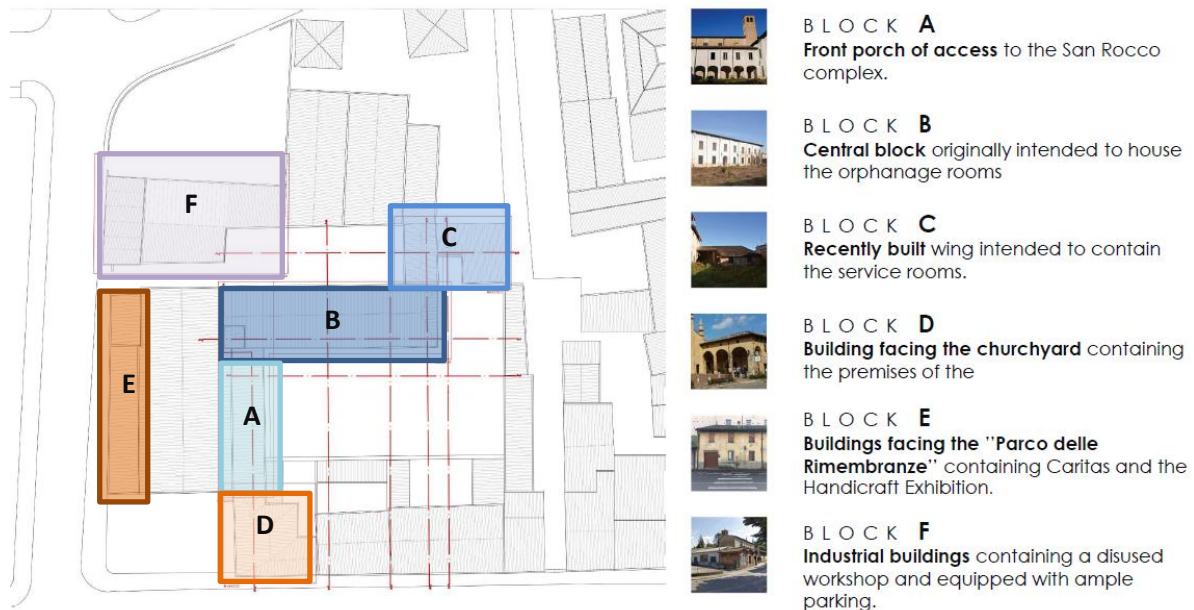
On the left the roof floor plan of the complex, where the portions of buildings subject to intervention are indicated. On the Right there is a photo and a brief description of the block.
